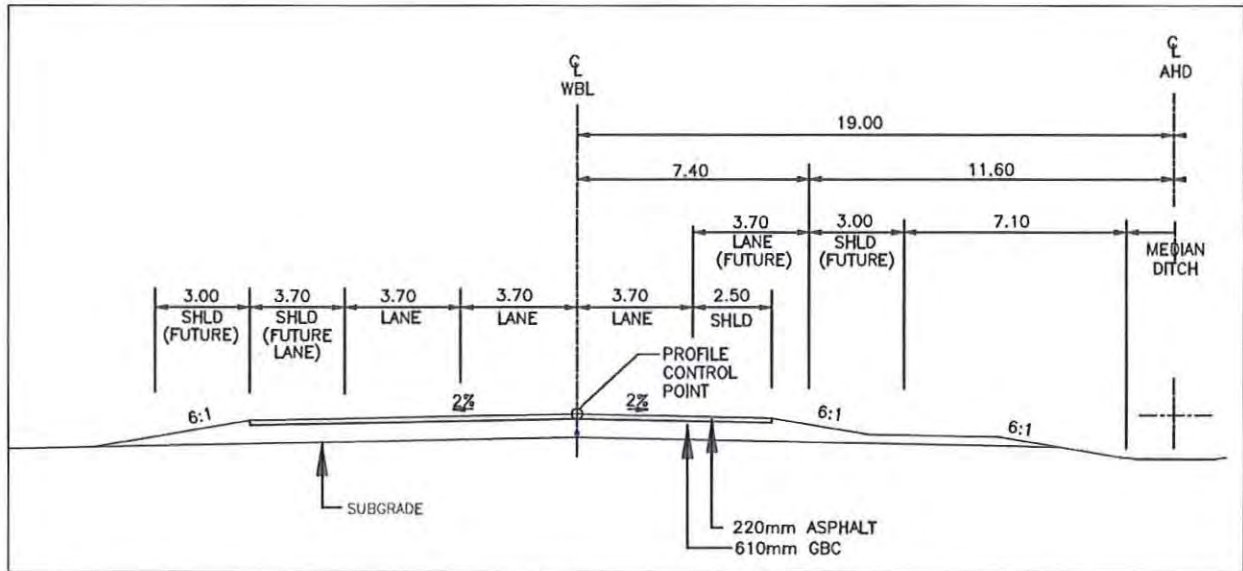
Anthony Henday Drive Southeast Leg Ring Road Typical 3-lane Road Section
